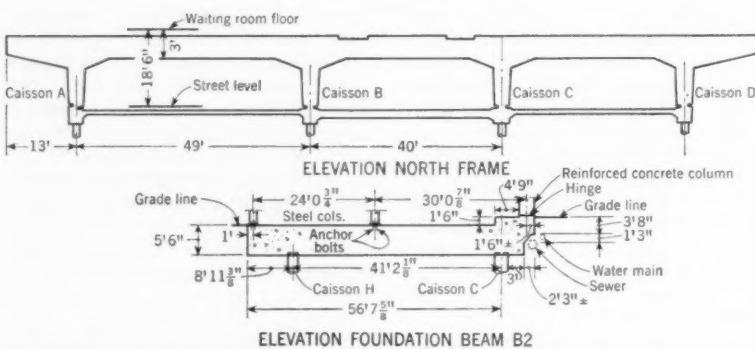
Elevation shows reinforced concrete frames and subsurface foundation girders locations of which are indicated in Fig. 3. These are supported entirely on Drilled-in caissons extending to rock.
